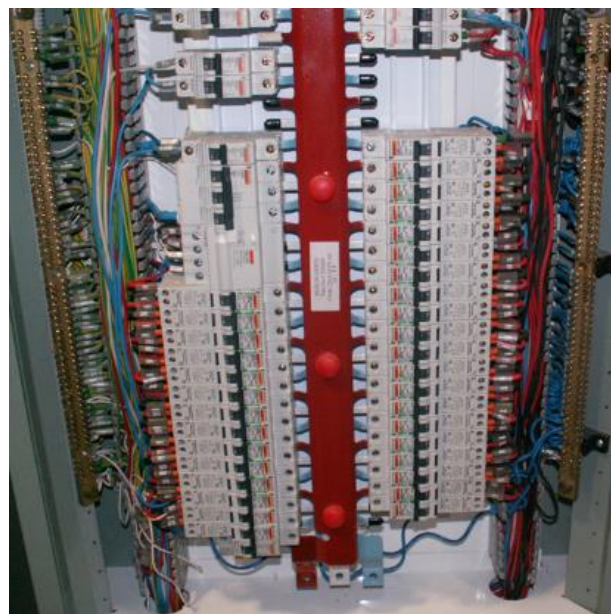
Example of office building electrical panel, showing many single-phase circuits feeding equipment on the floor plan
